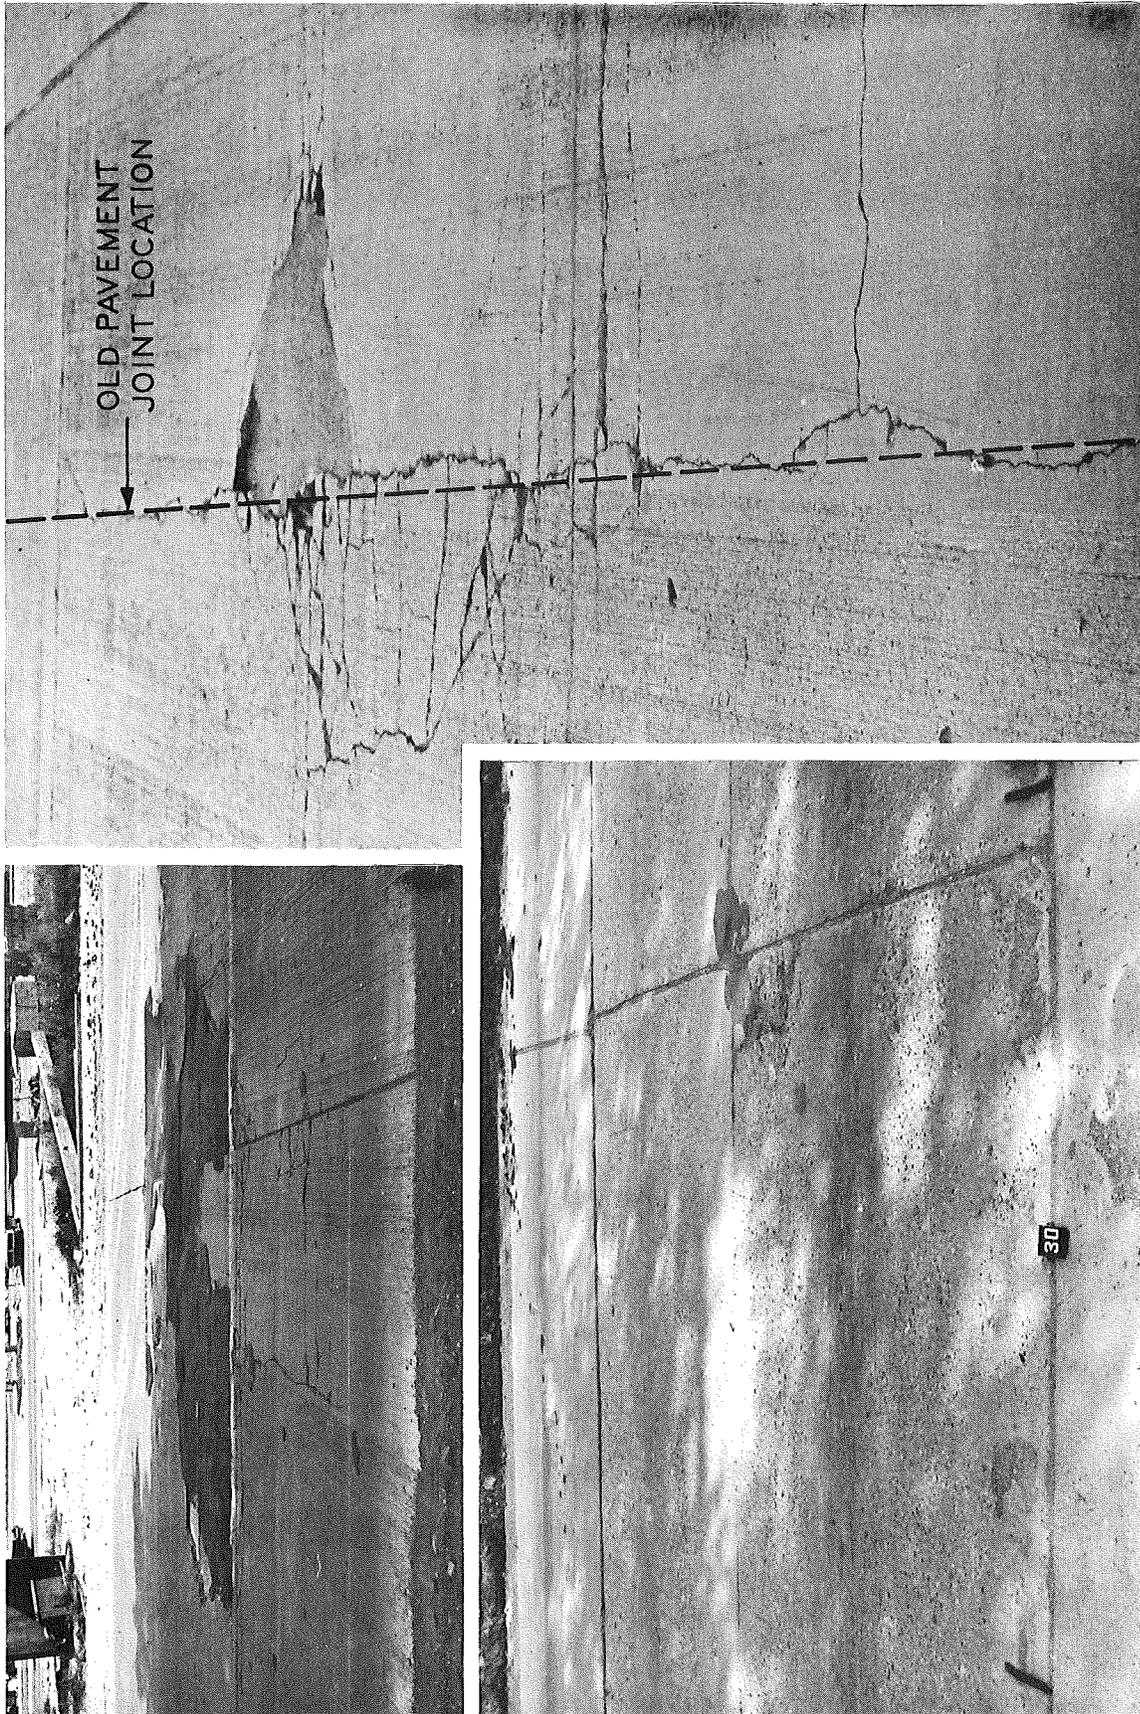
Extent of failure at the location where initial failure occurred. Photo at lower left shows original pavement; overlay at age 3 months (right); and, overlay at age 9 months (upper left).
